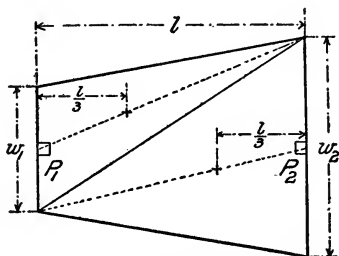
Diagram of Combined Footing, Two Unequally Loaded Columns, Trapezoidal Area.
